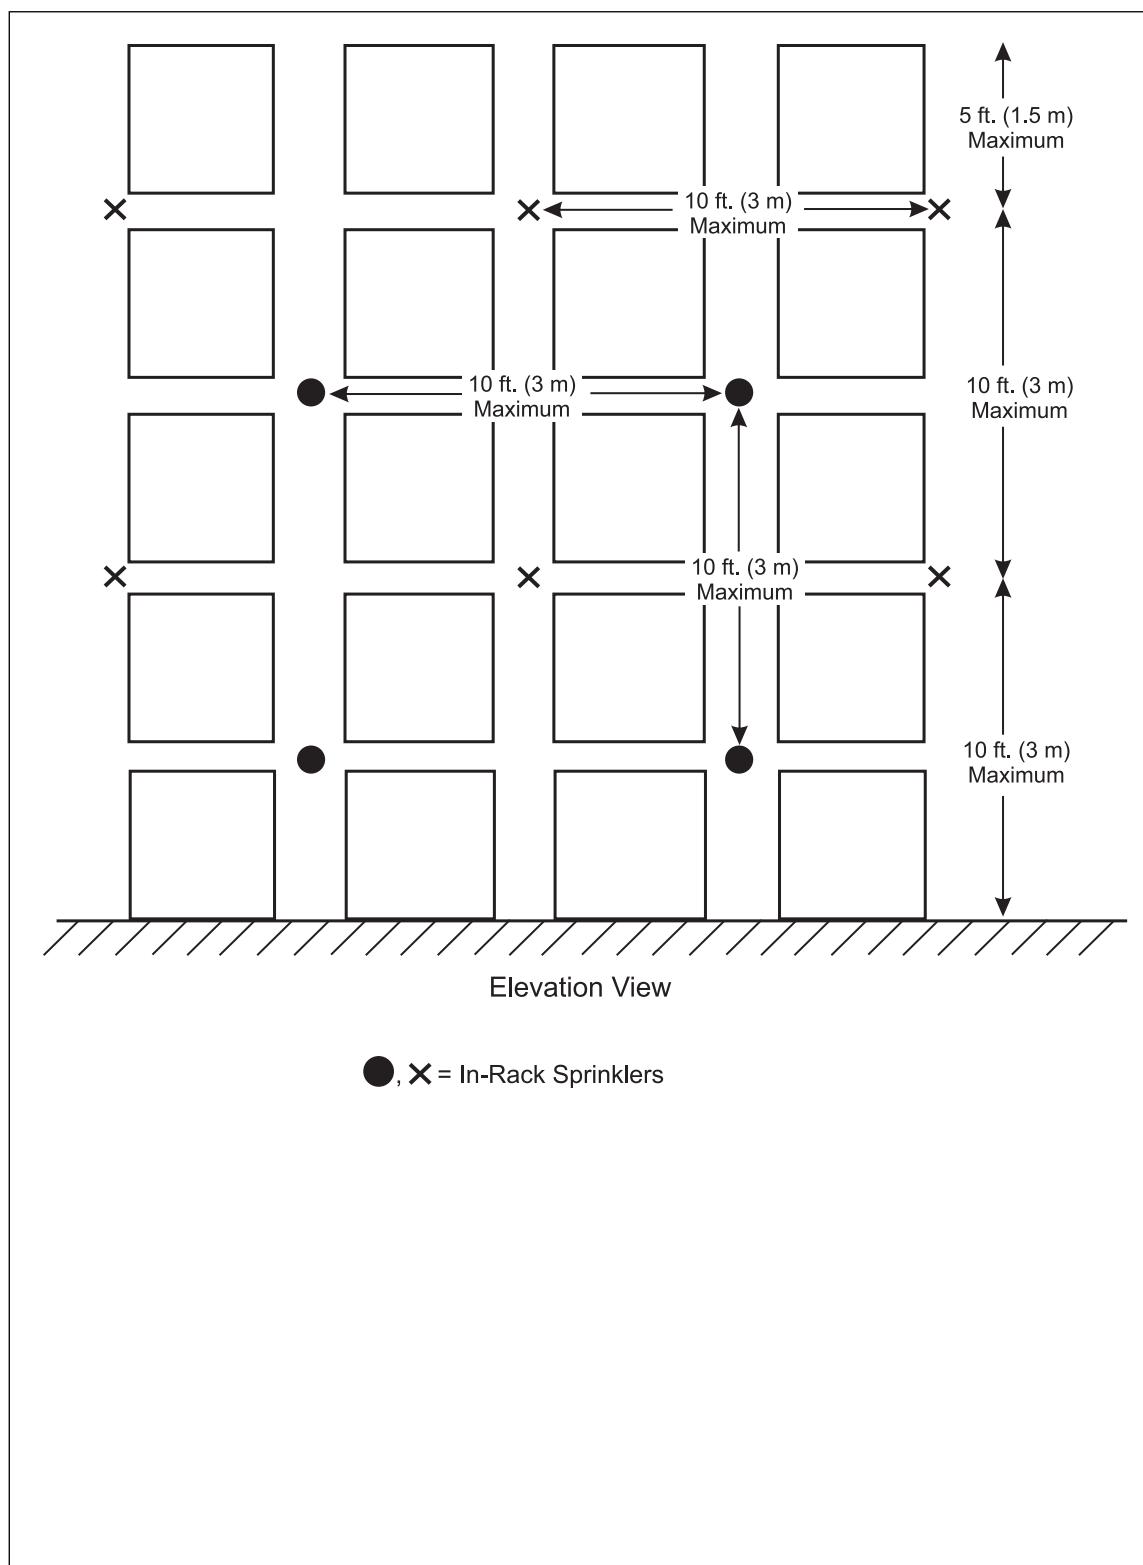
Multiple-row rack sprinkler layout: quick response sprinklers protection scheme (elevation view)
